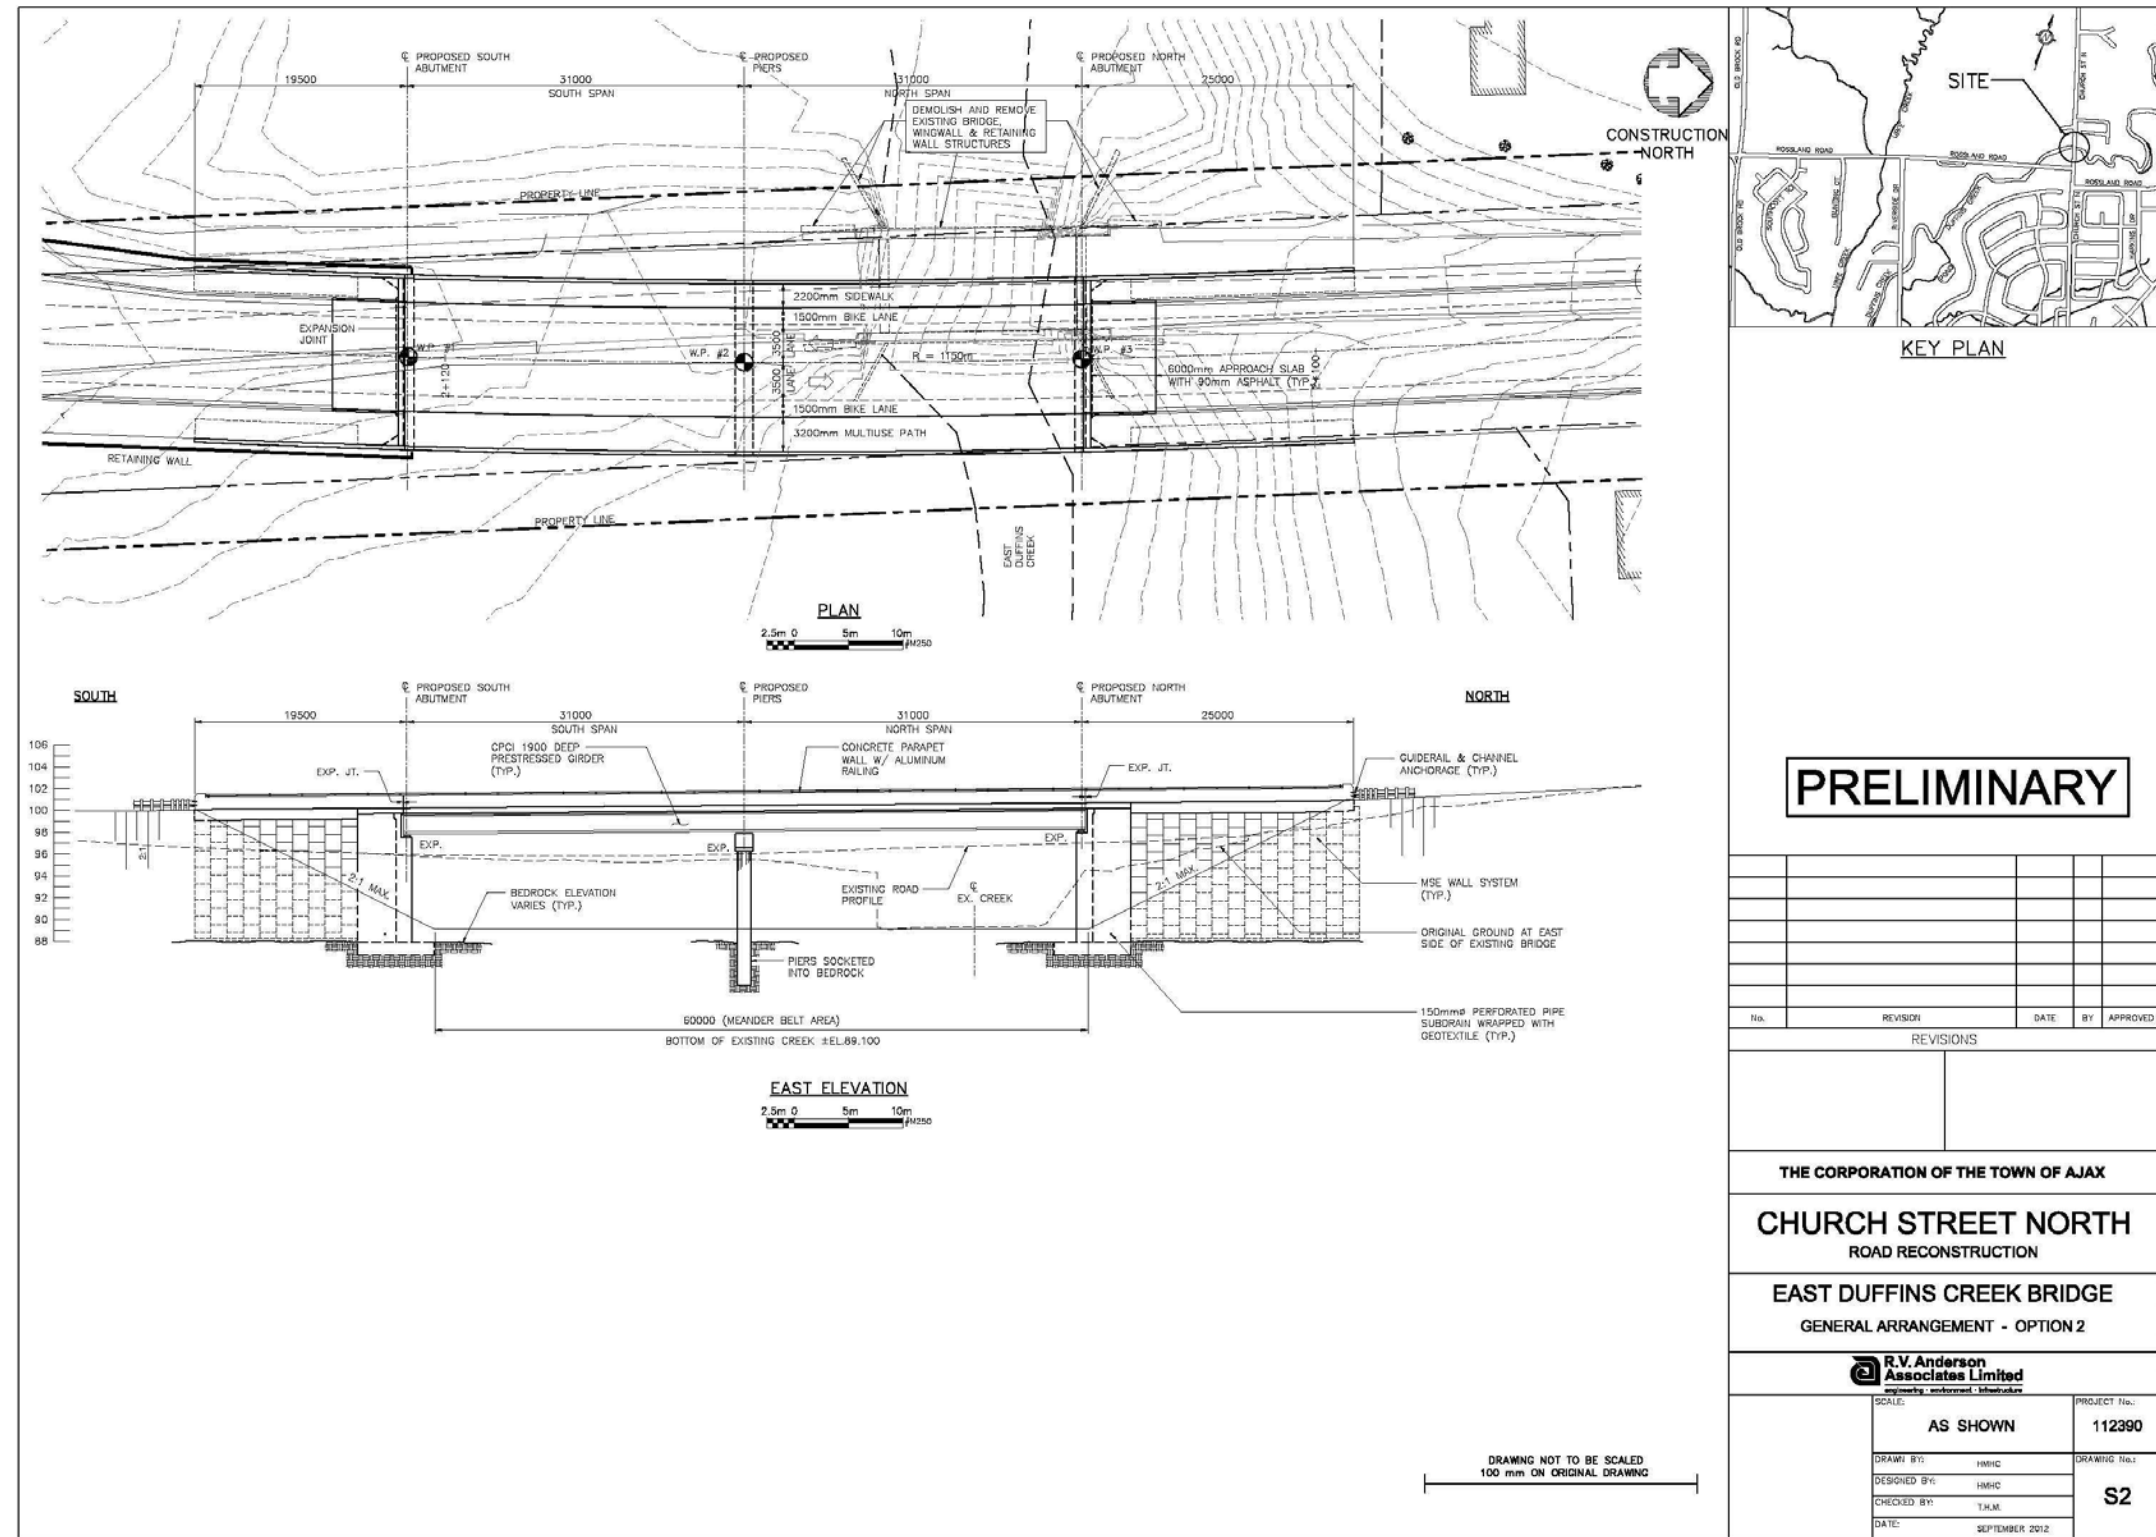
Preliminary General Arrangement – Two Span Bridge
